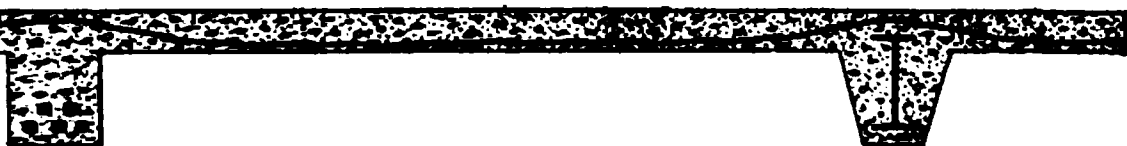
Concrete Floor-construction. Expanded-metal Reinforcement
